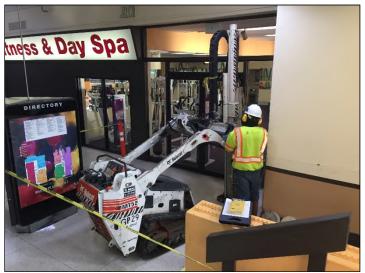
Installation of 3.75-inch O.D. hollow casing at SB-14 for the installation of MW-7.
